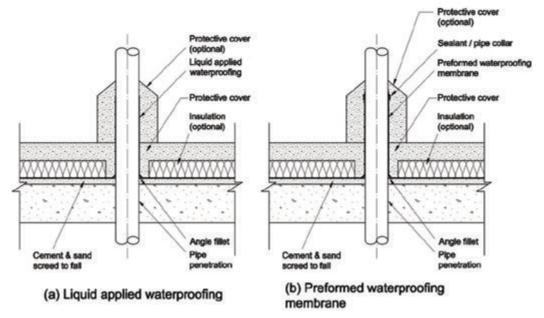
Typical detailing for pipe penetration of flat roofs Source: SS 637: 2018 Code of practice for waterproofing of reinforced concrete buildings
